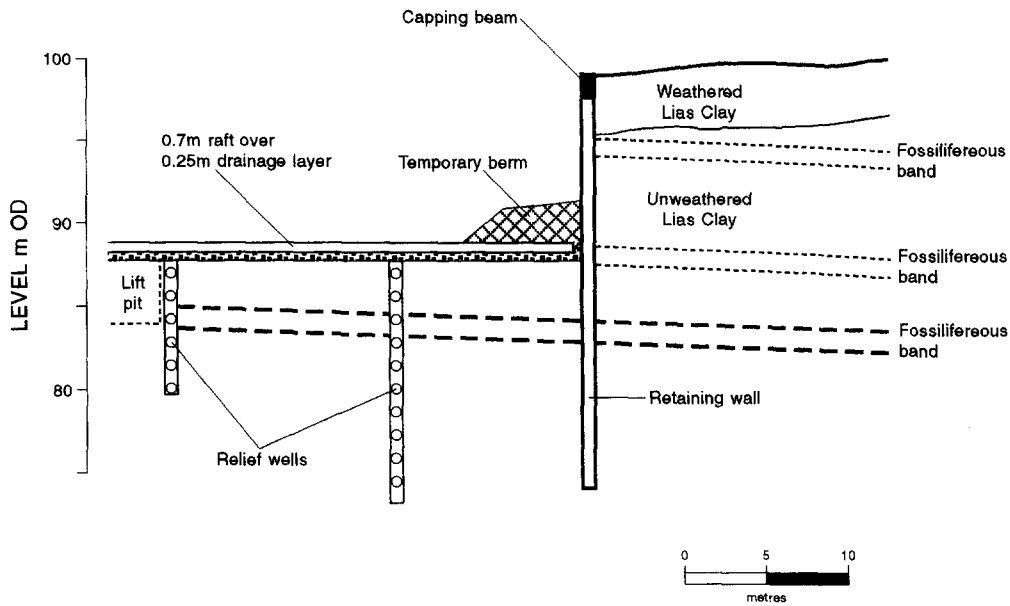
Cross section of the site geology and construction details (Ford *et al.*, 1991).
